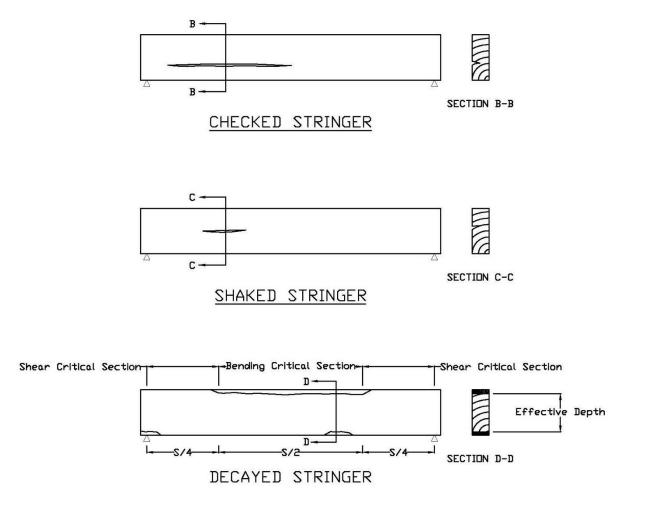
Checked, Shaked and Decayed Timber Stringer Defects
